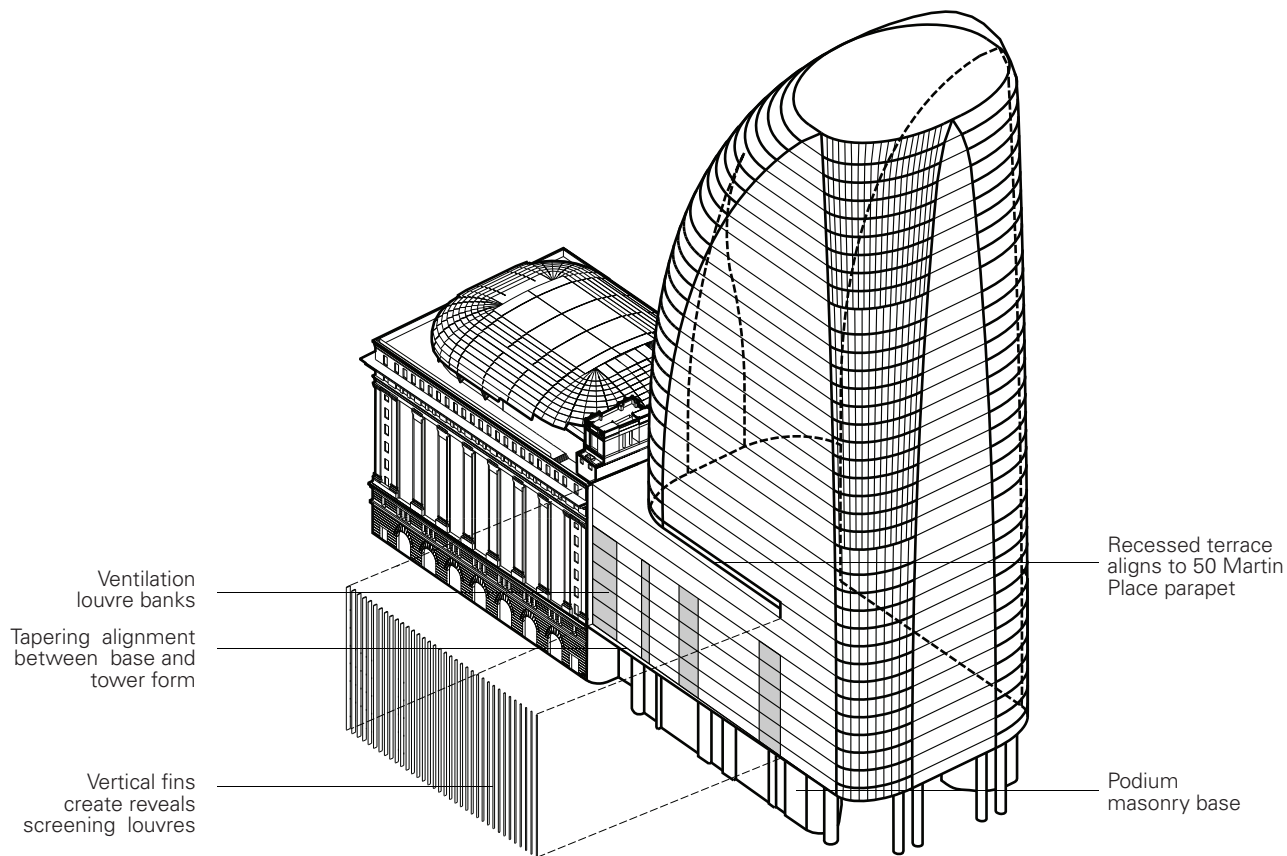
Podium facade elements - Elizabeth Street and Hunter Street corner
